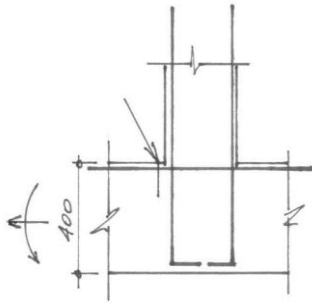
Floor section, 400 mm thick, eccentrically loaded
